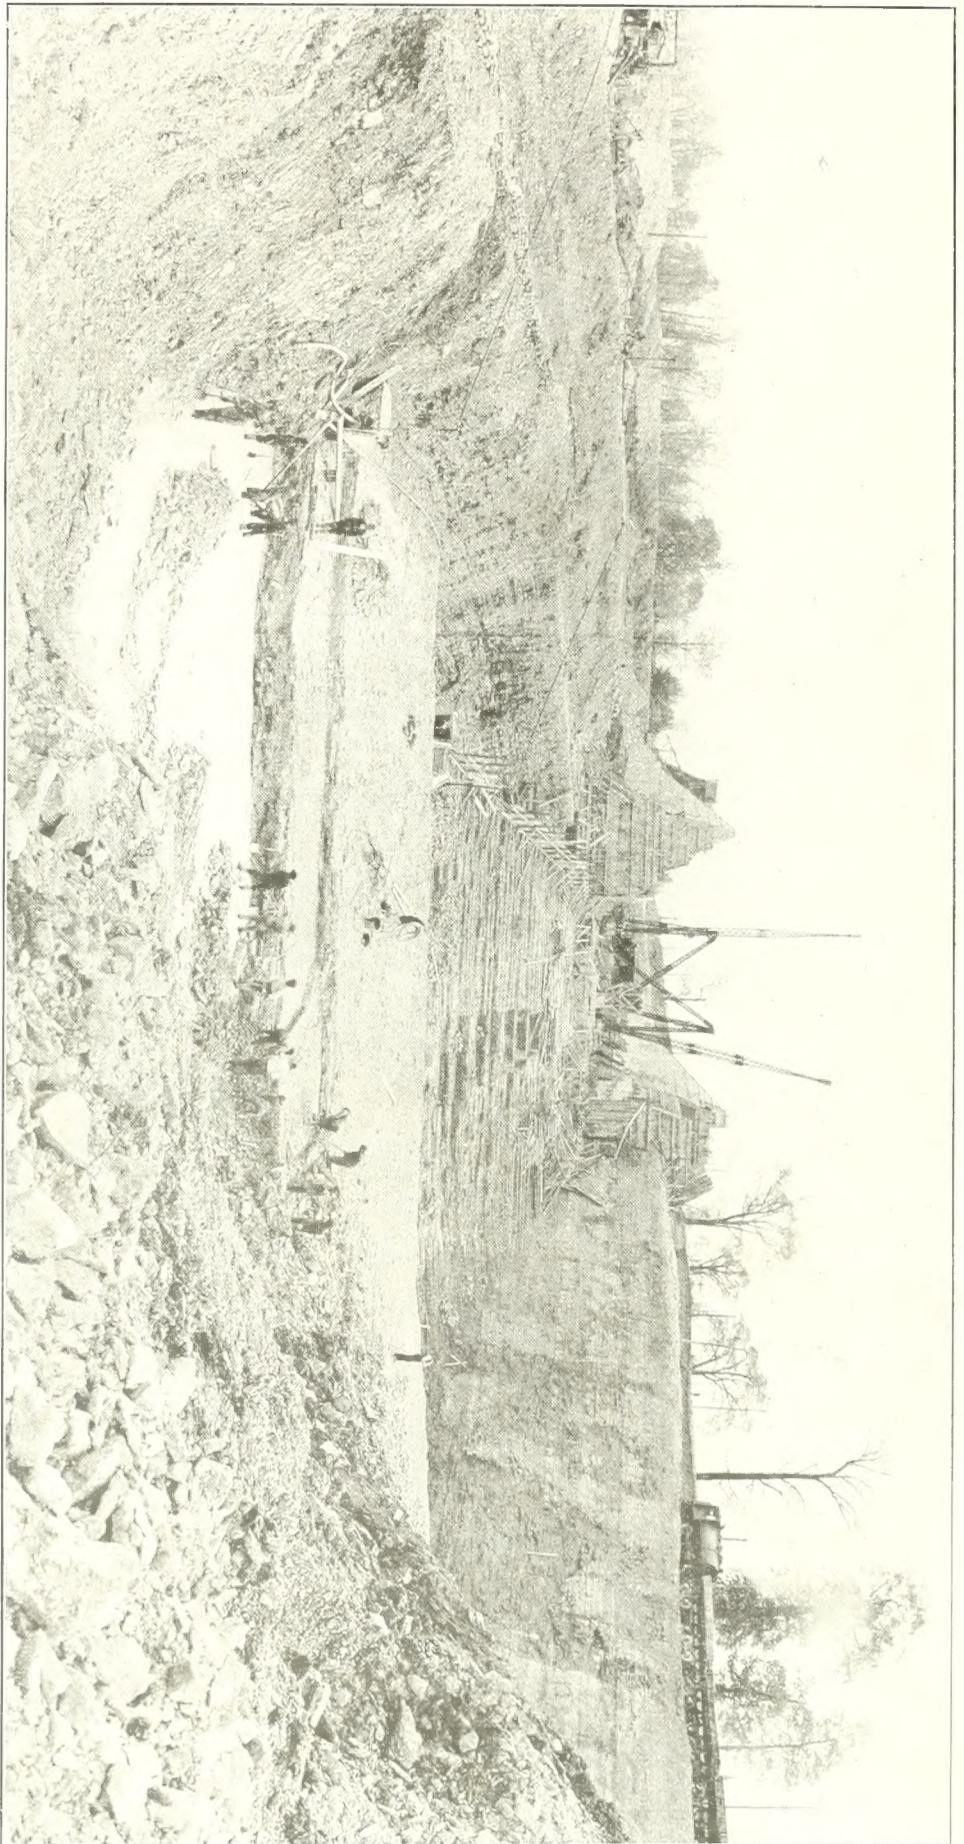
HUFFMAN OUTLET EXCAVATION, AND CONDUIT AND SPILLWAY STRUCTURE WALLS, MAY 15, 1919.
